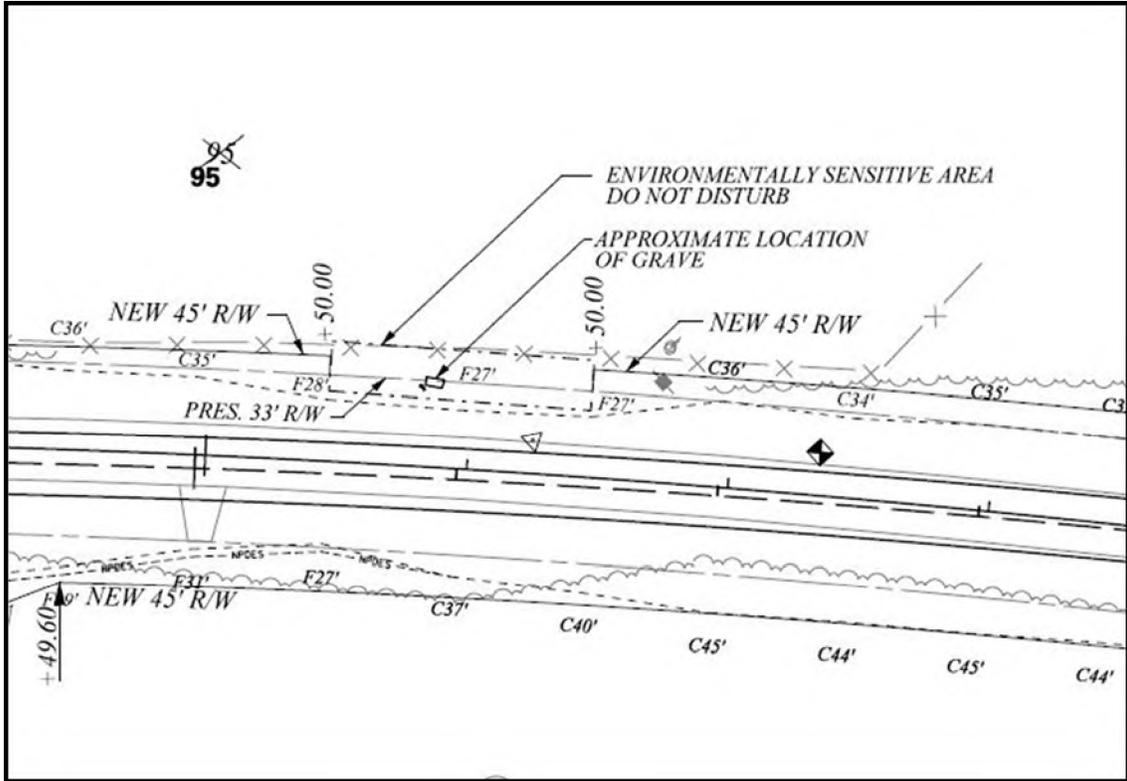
SCDOT Construction Plans Showing Provisions Made to Protect Site 38CS420/0303.
